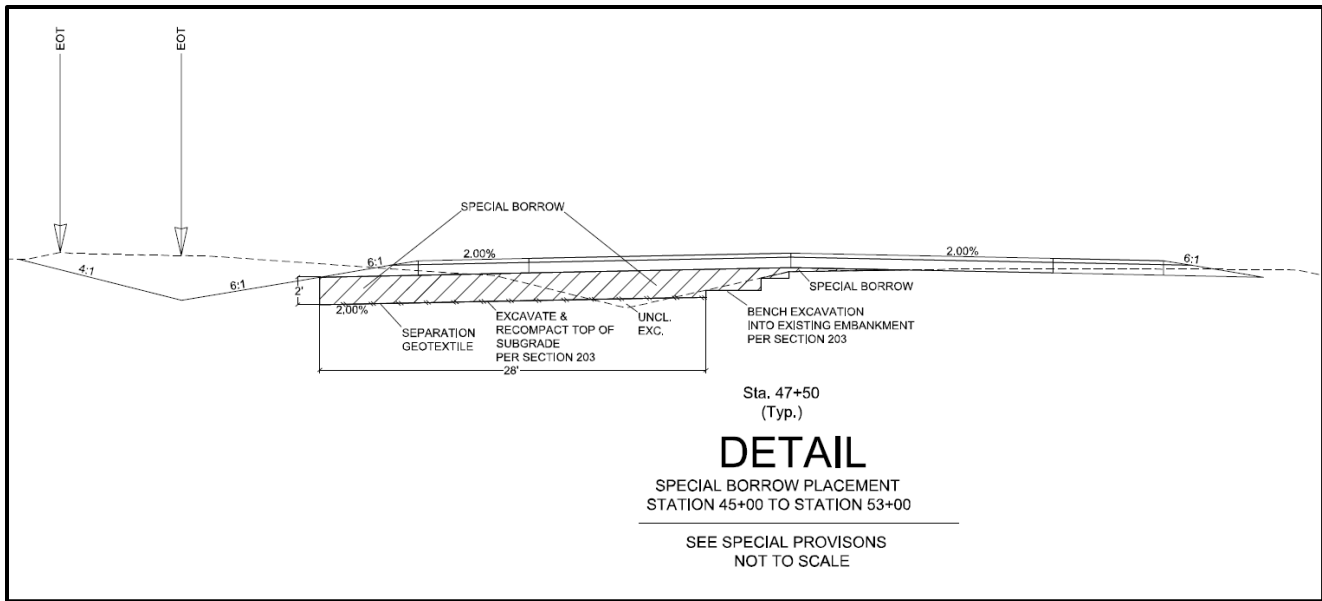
Special Borrow Placement for Subgrade Support. Station 45+00 to Station 53+00.
